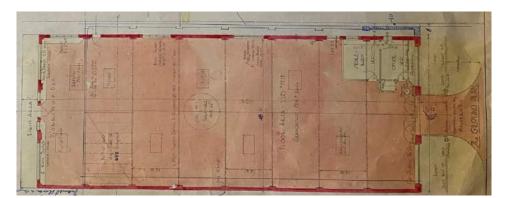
The ground plan of the earlier proposed design for the brick garage. North is right (SHC MB5178).
